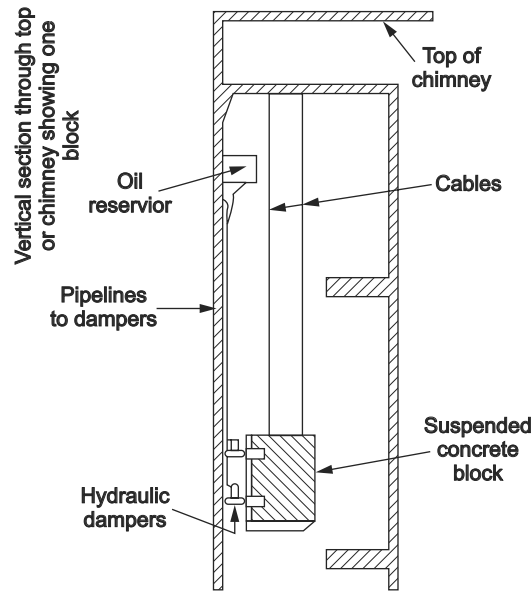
Chimney vibration: Wind excited, 200 metres high 18 metres square chimney $\omega_n = 0.455$ CPS. Damping introduces – 6 hydraulic damper between each concrete block + chimney, each block 25 ton on 40 ft. long cables. Natural frequency (horizontal) of mass-cable = 14 CPS.
